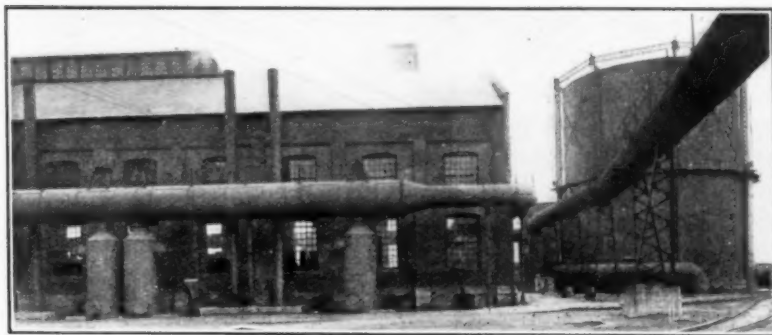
EXTERIOR VIEW OF POWER HOUSE; GAS HOLDER AND GAS RECEIVERS
